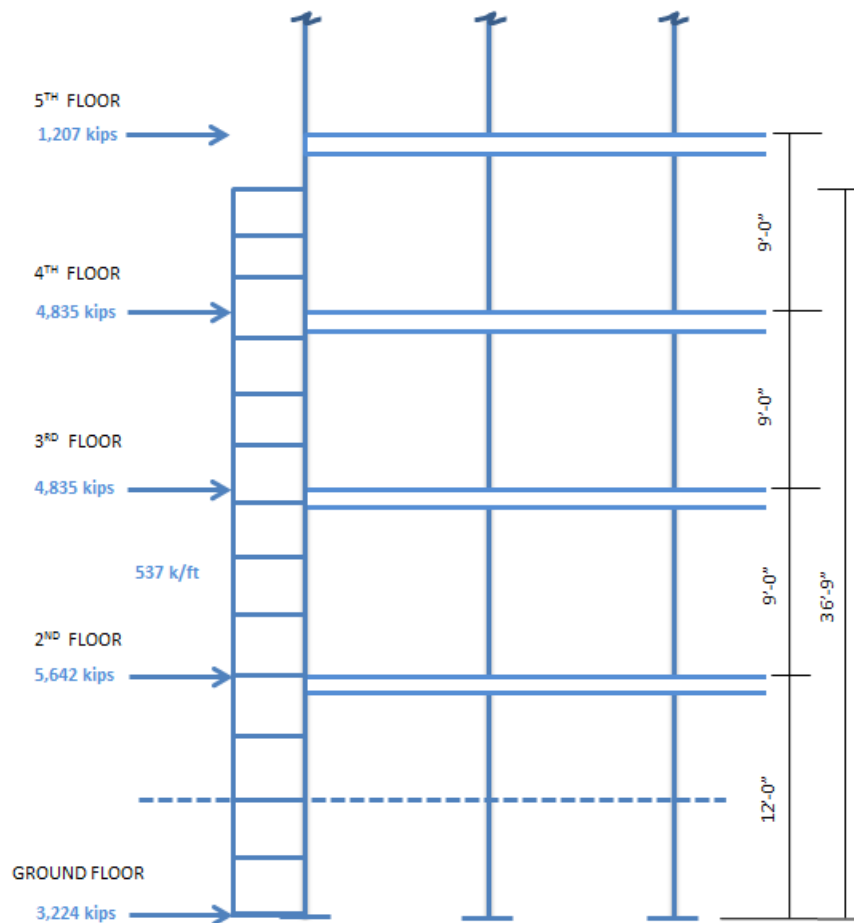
LC2 Tsunami loads on overall Hilo Residential building
